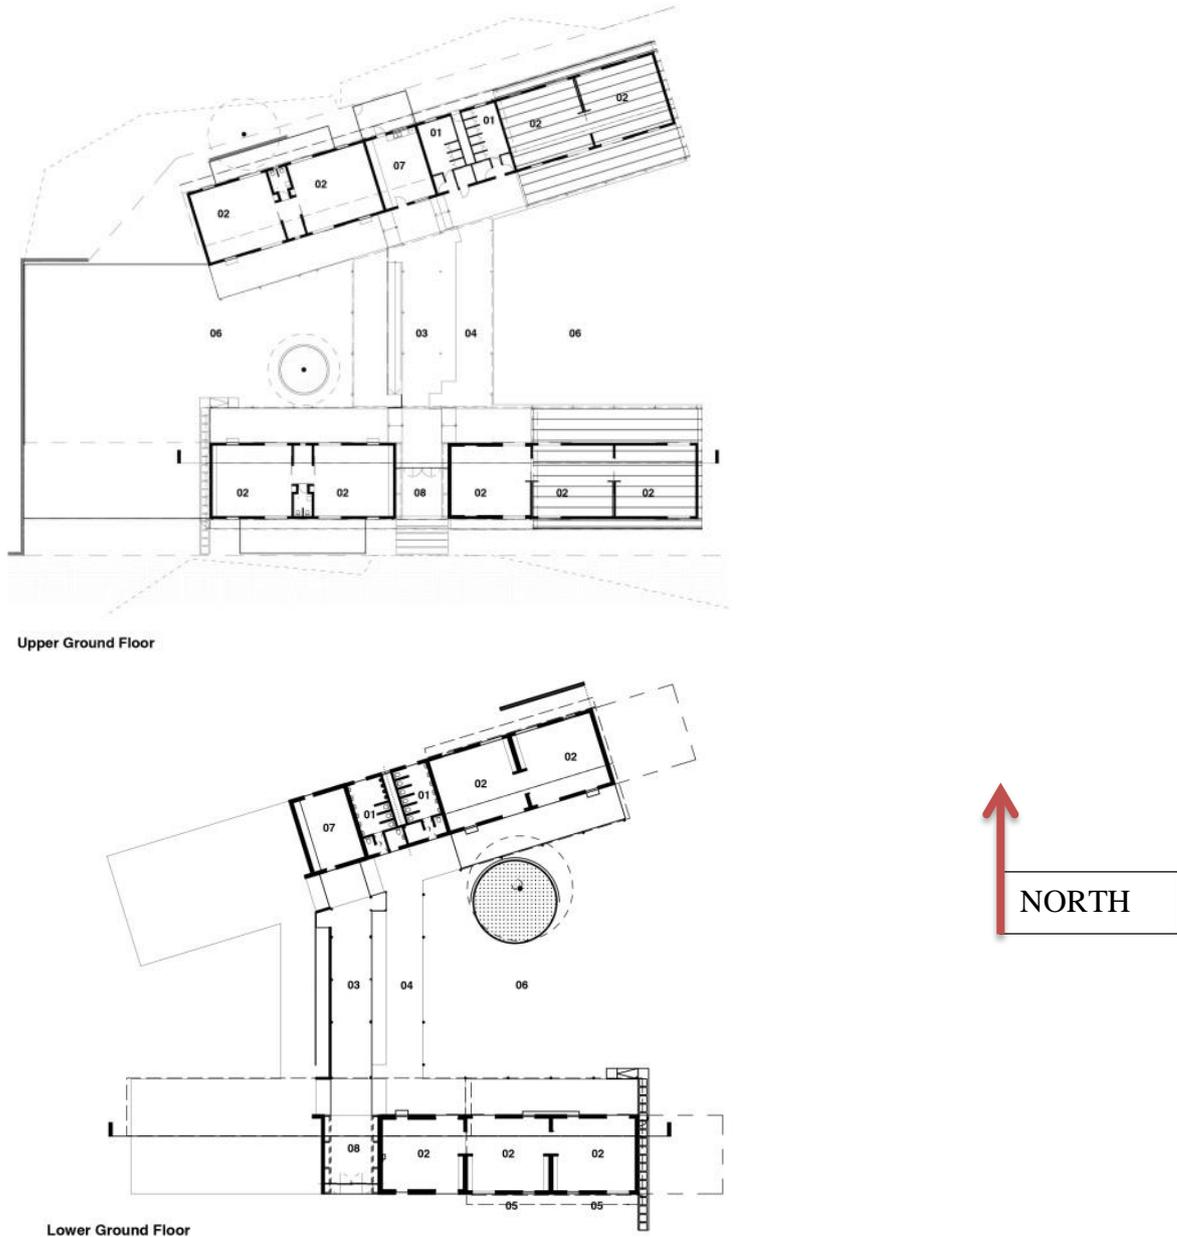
LIV Children's Village ECD Upper and Lower Ground Floor Plans (Not to scale)
